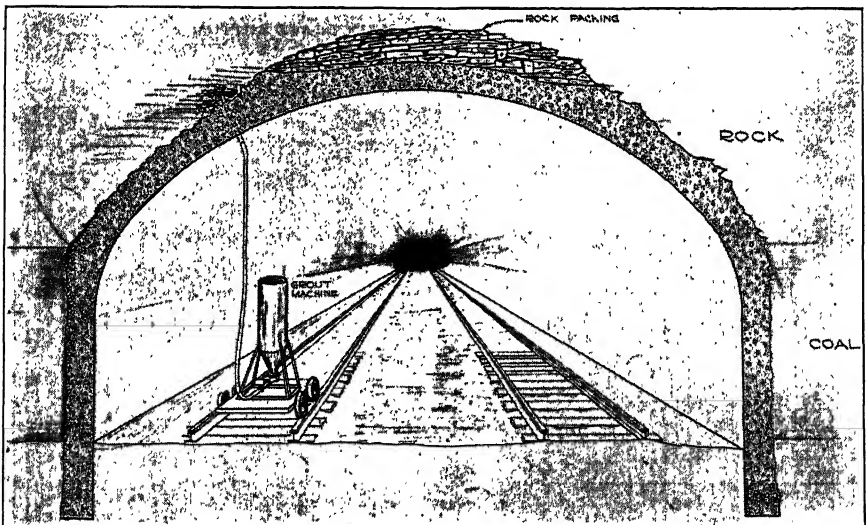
SECTION OF MAIN ARCH, SHOWING ROCK PACKING AND GROUTING.
